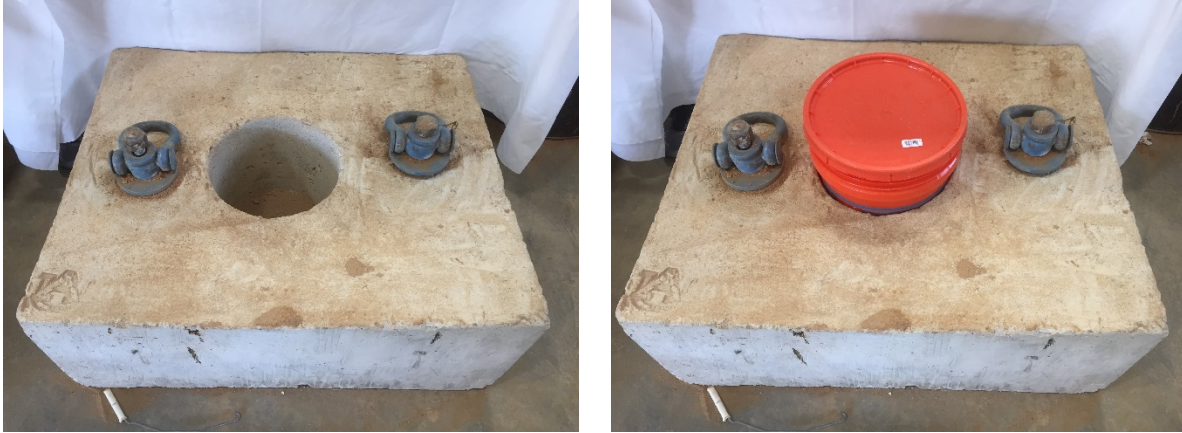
Reinforced concrete confined block with and without DCP specimen
